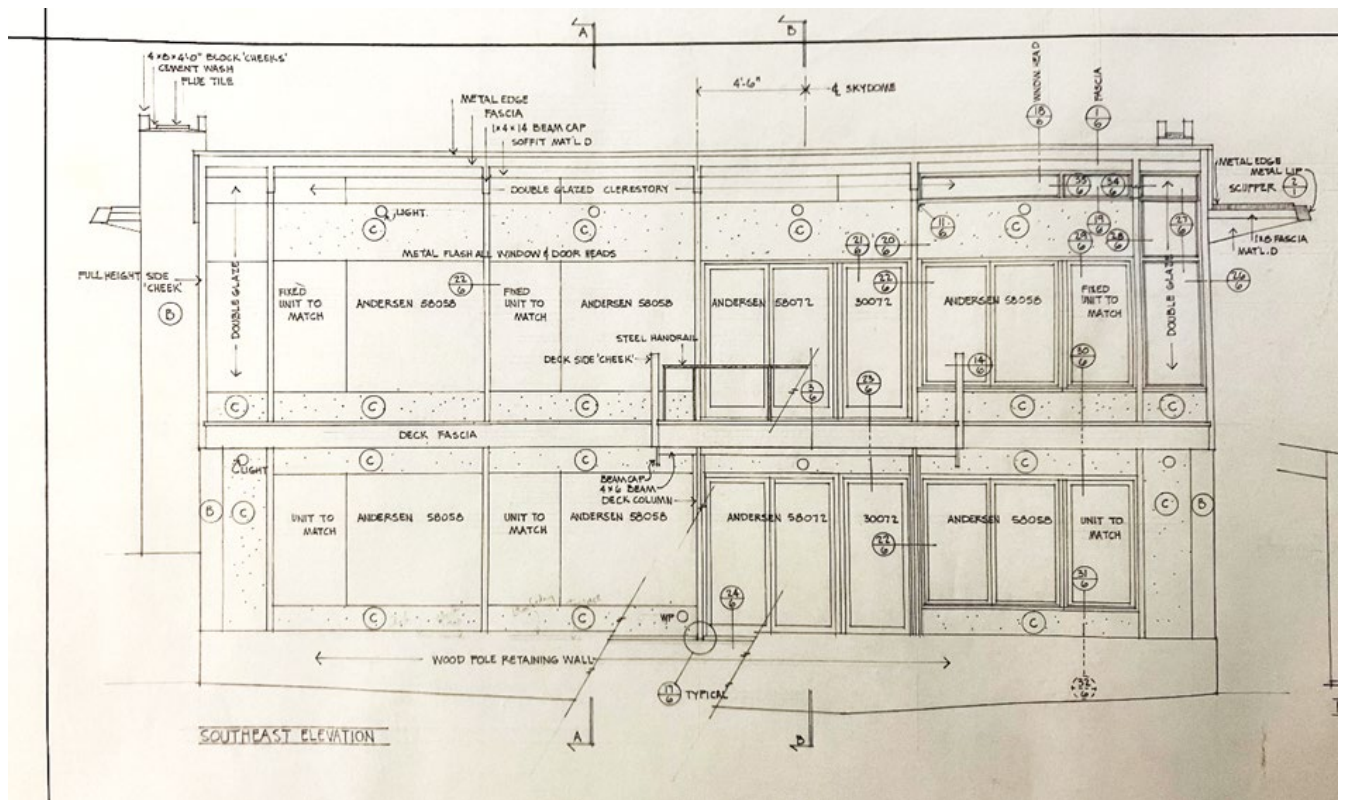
Working drawing, southeast elevation. Close Associates Papers
